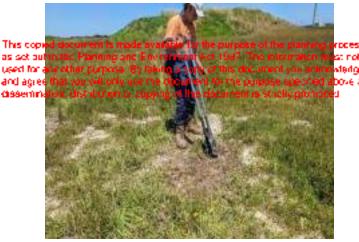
Location of sample S11 around former dam area (92 Enterprise Road).
